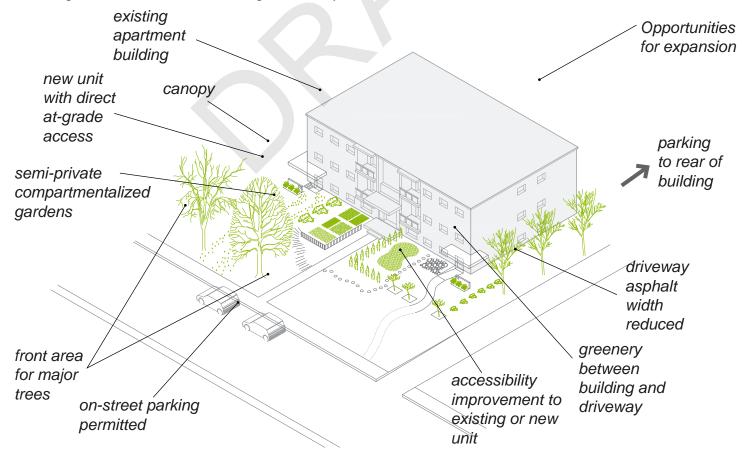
Demonstration Plan for possible renovation of low-rise apartment building
